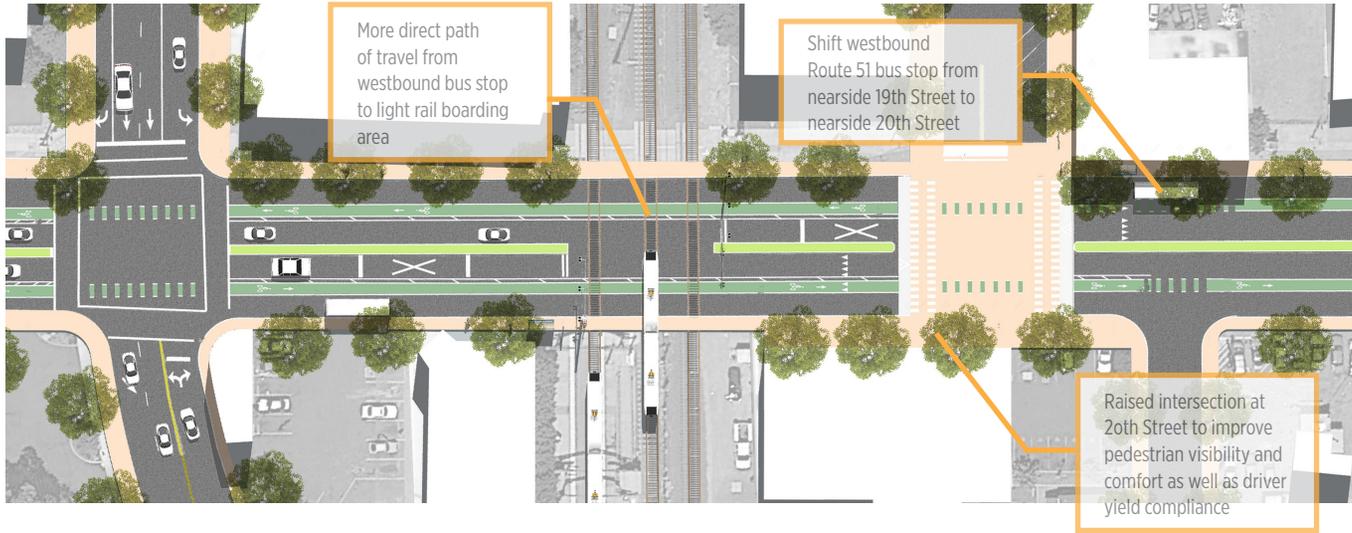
BROADWAY STATION LIGHT RAIL OPTION 1 BIRD'S EYE RENDERINGS
